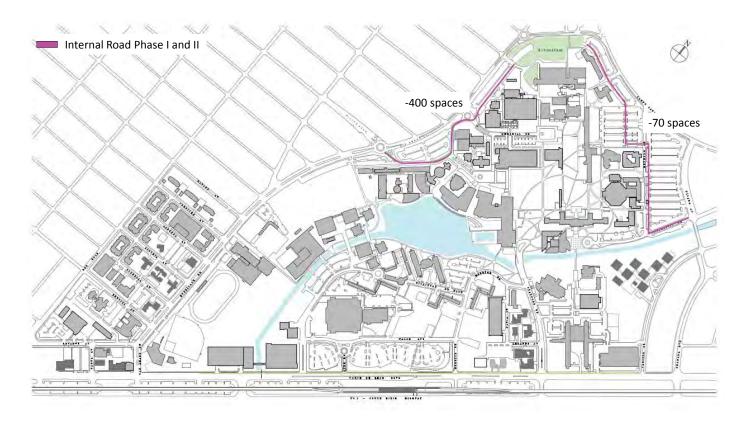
Exhibit D: Internal Road Phase I and II - Proposed Phase II Route and Location of Eliminated Spaces
